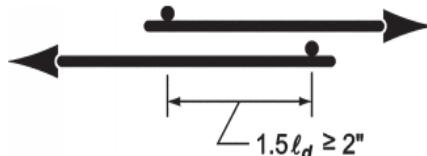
Lap Splices of Plain Welded Wire Reinforcement where $(\text{Provided } A_s)/(\text{Required } A_s) \geq 2$ (adapted from ACI 318-14, Courtesy of ACI)
